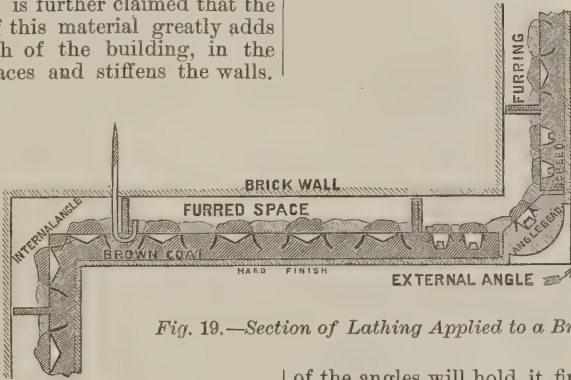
Section of Lathing Applied to a Brick Wall.
